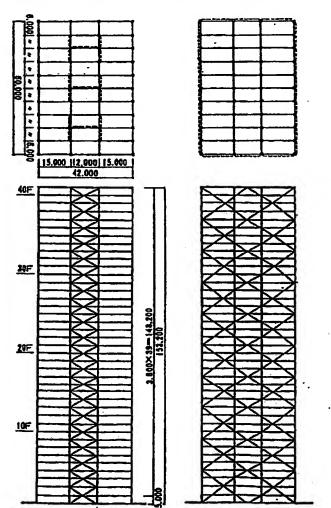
Frame structure with multi-storied earthquake-arouf walls
